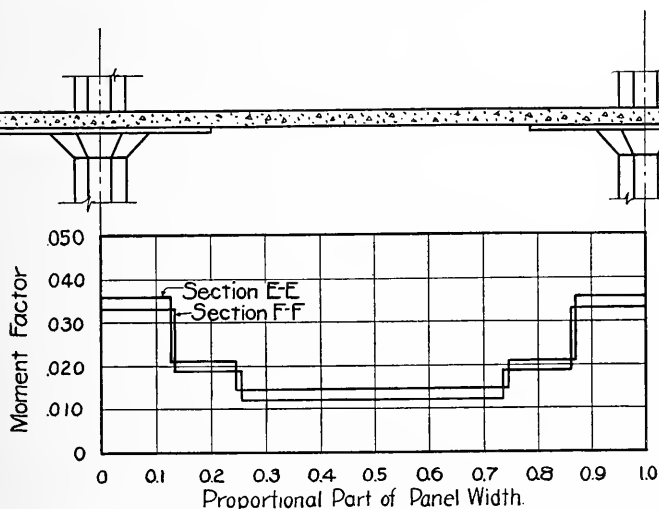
MOMENT FACTOR DIAGRAM FOR SECTIONS OF POSITIVE MOMENT (SECTIONS E-E AND F-F) OF CENTRAL TEST PANEL, SHREDDED WHEAT FACTORY.
